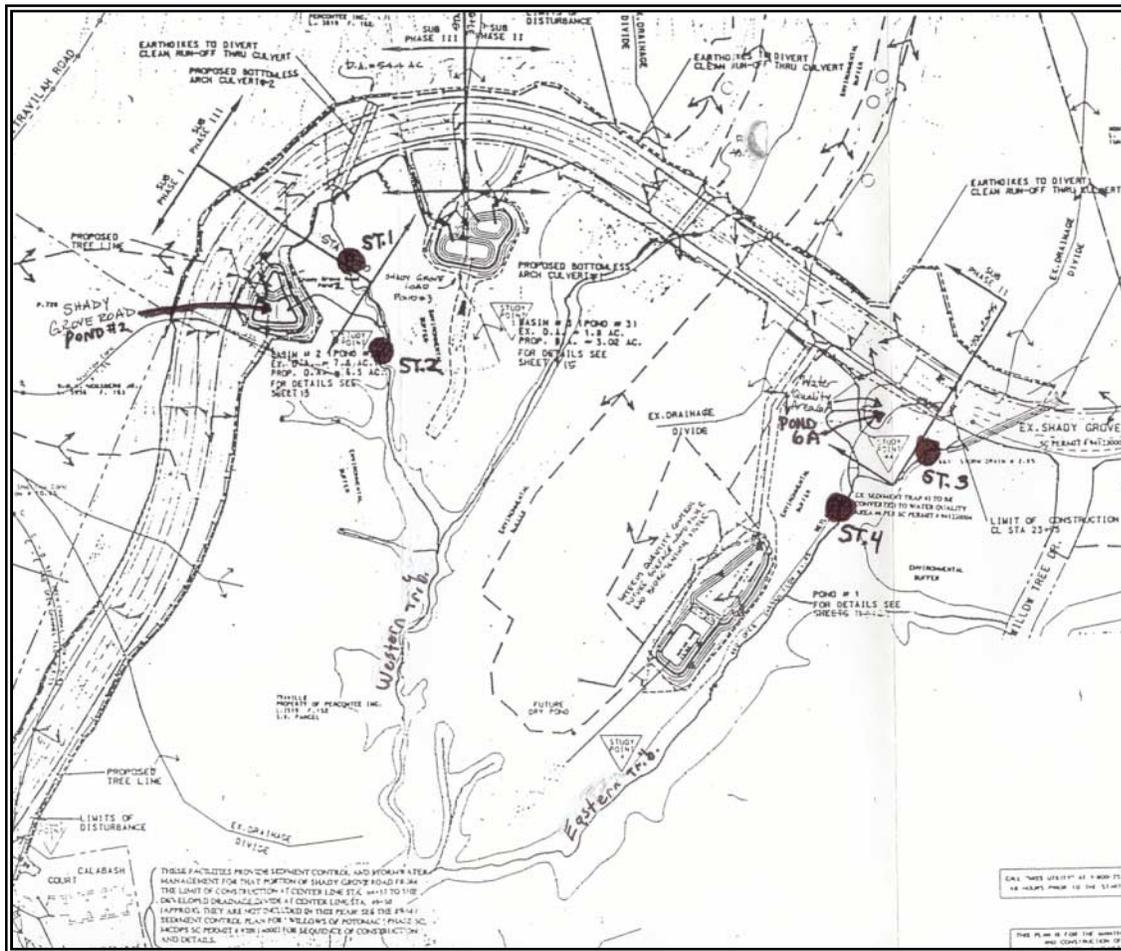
Site Map of Shady Grove Road Extended Construction Project.
